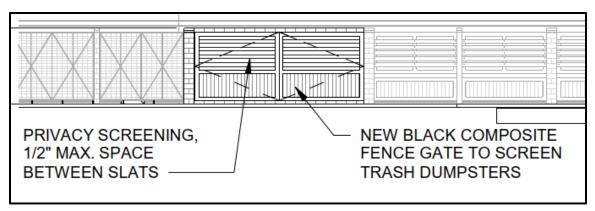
Trash Enclosure Elevation (full image can be found in applicant's packet)
